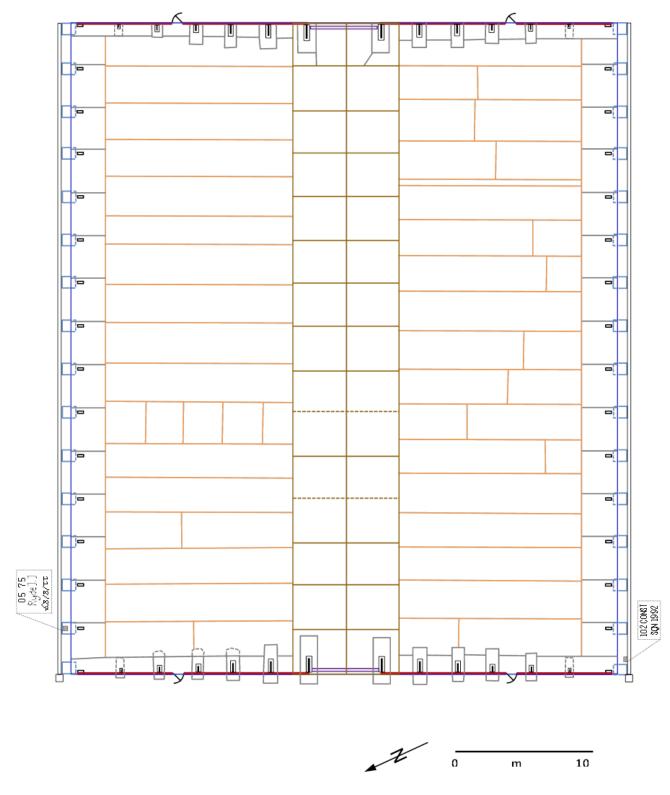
Plan of CUST Hut, showing ground features including evident footings, and concrete slab joins
